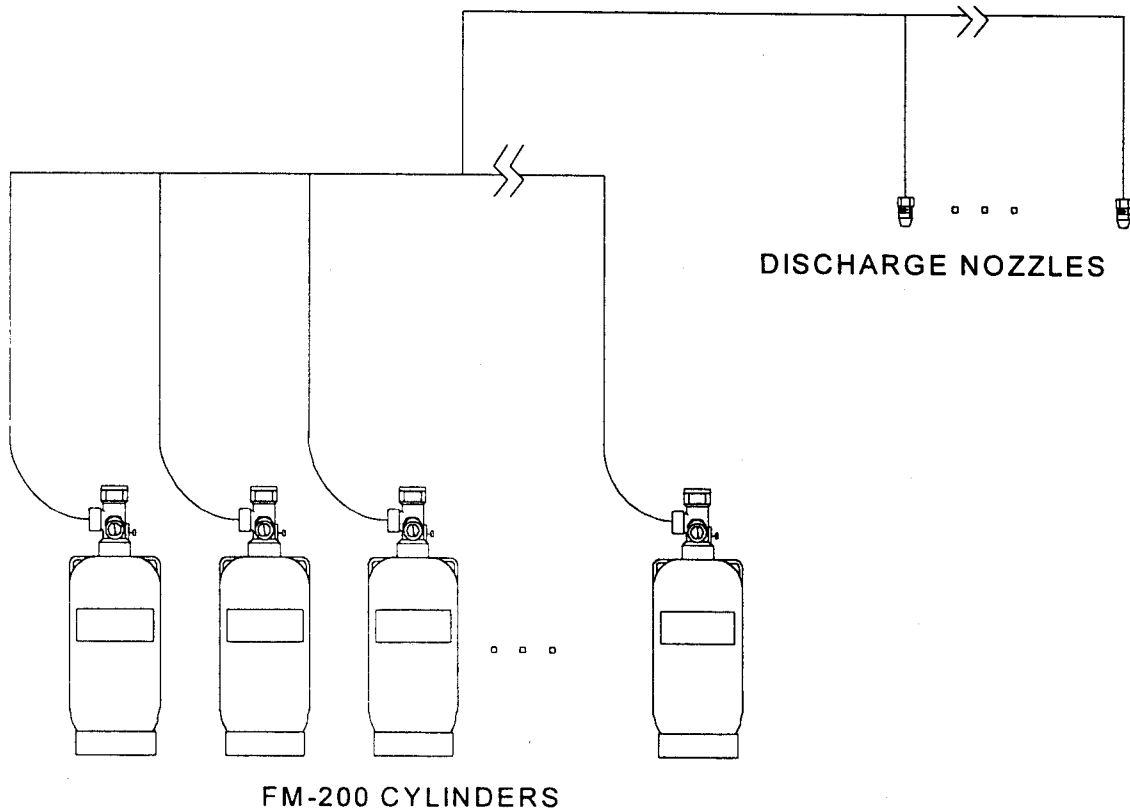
Central storage system with common manifold and discharge piping (actuation components and EL-checks not shown).
